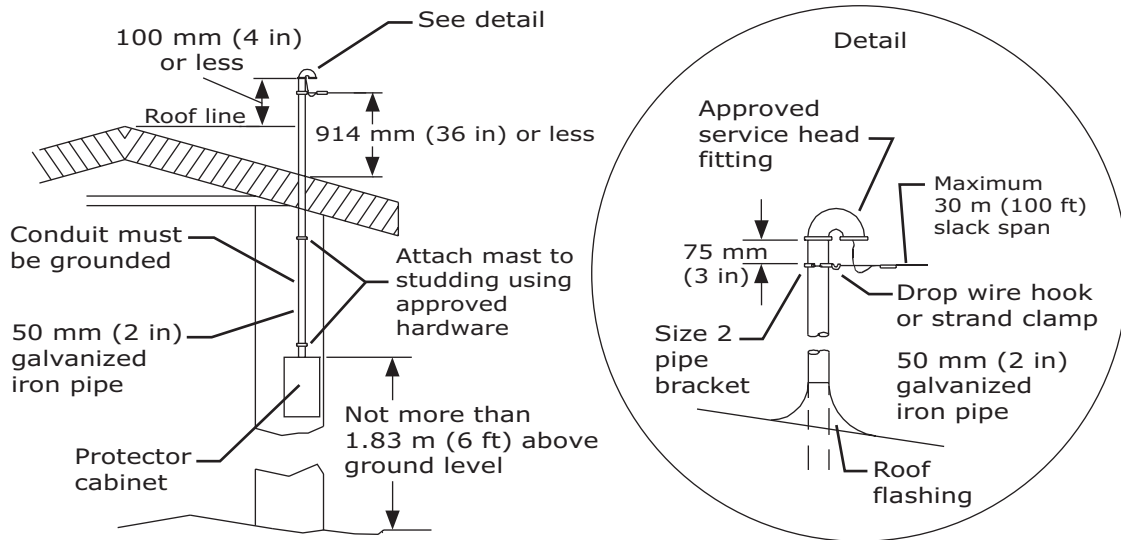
illustrates how a typical vertical conduit mast may enter the building.
